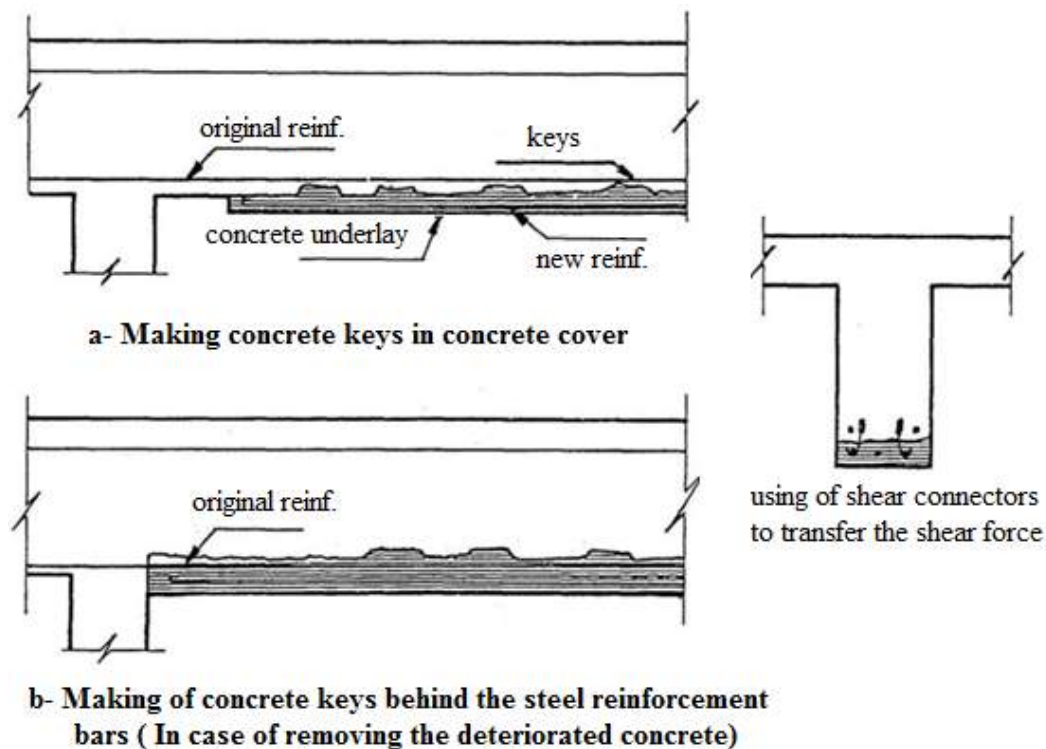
Addition of concrete underlay in tension zone (Source: Abu Almjid, 1988).
